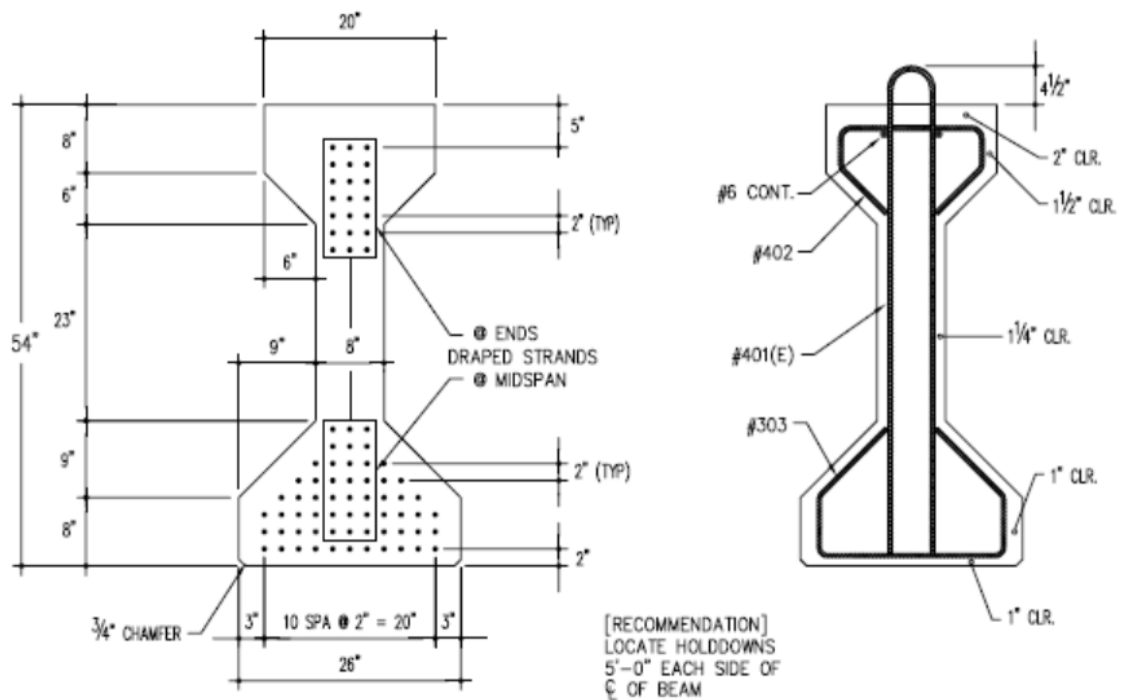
Dimensions and reinforcement layout for AASHTO type-4 girder
